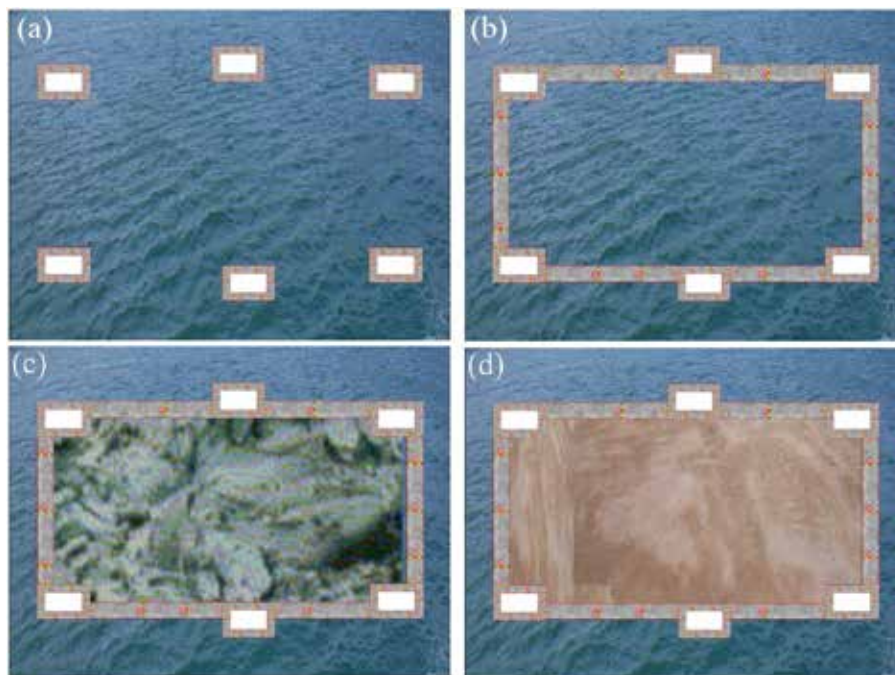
Plan view of a conceptual design and construction process of land reclamation of island on sea with GJPRCP technology
